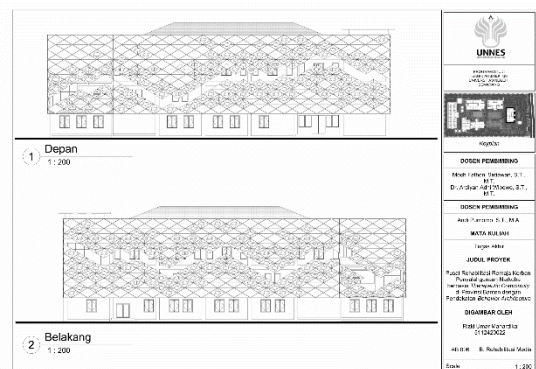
Medical Rehabilitation Building Front and Back Elevation
